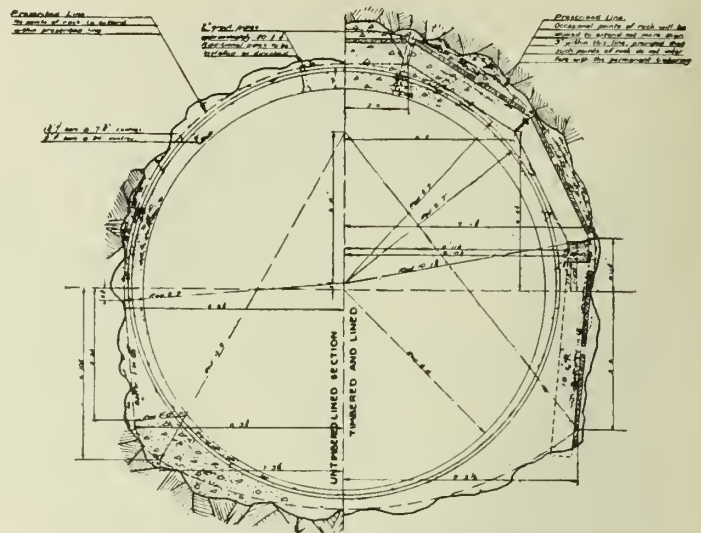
Cross-sections of Main Bridge River Tunnel.
